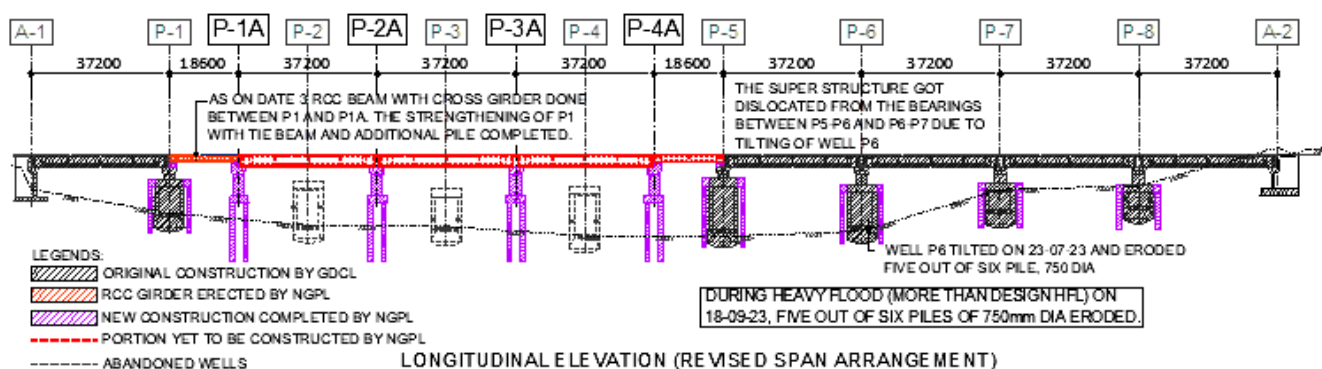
Span Arrangement of the Bridge as per Revised Design
